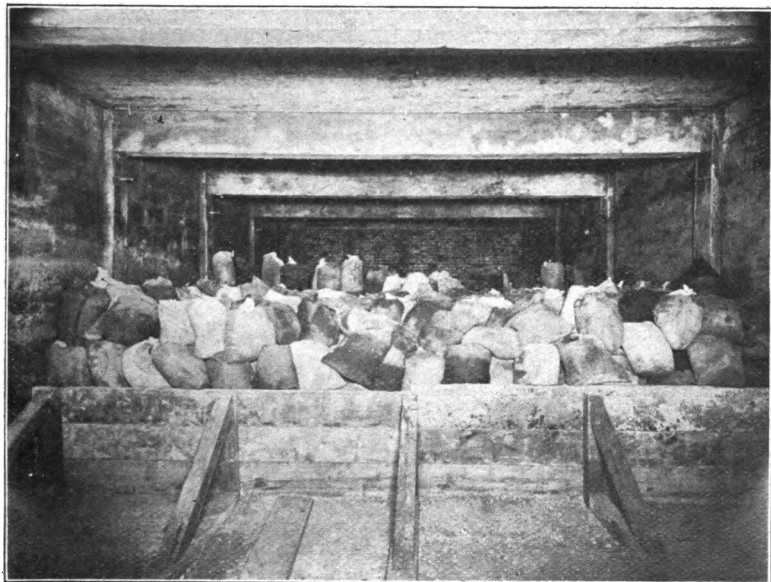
Test of Girders and Floor. Champion Ice Co.'s Cold Storage House, Covington, Ky. Load, 150,000 pounds; 400 pounds per square foot.
